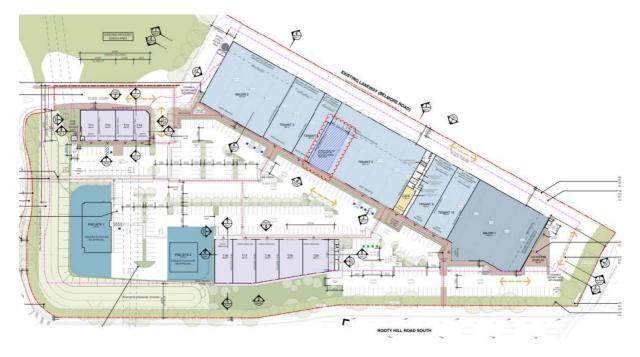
| Proposed updated floor plan (Source: Applicant's Modification Application)
